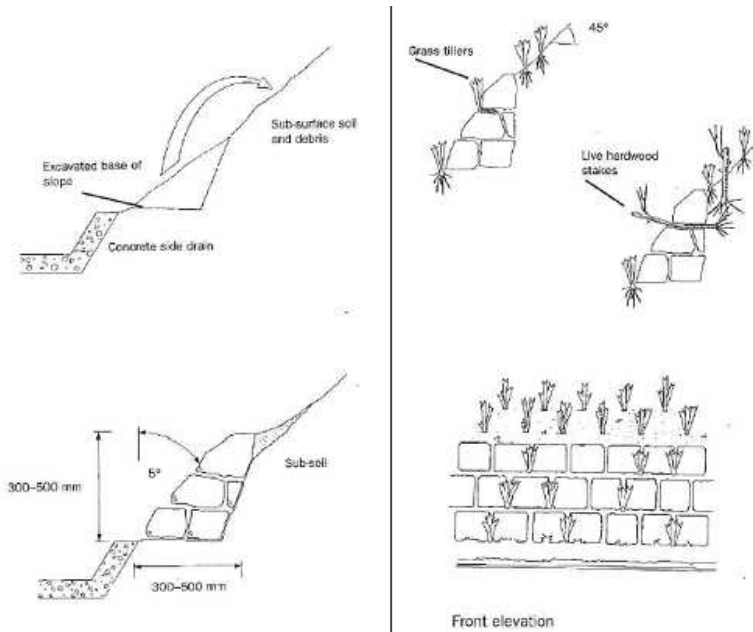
Dry stone toe wall with vegetation (Clark and Hellin, 1996).
